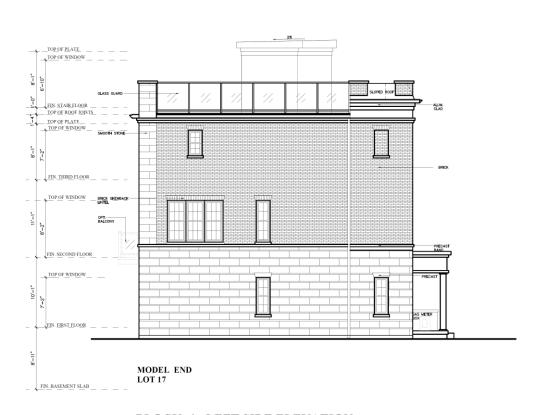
Block 4 Rear Elevation, Sheet A2 (FBP Architects Inc., September 1, 2023)
